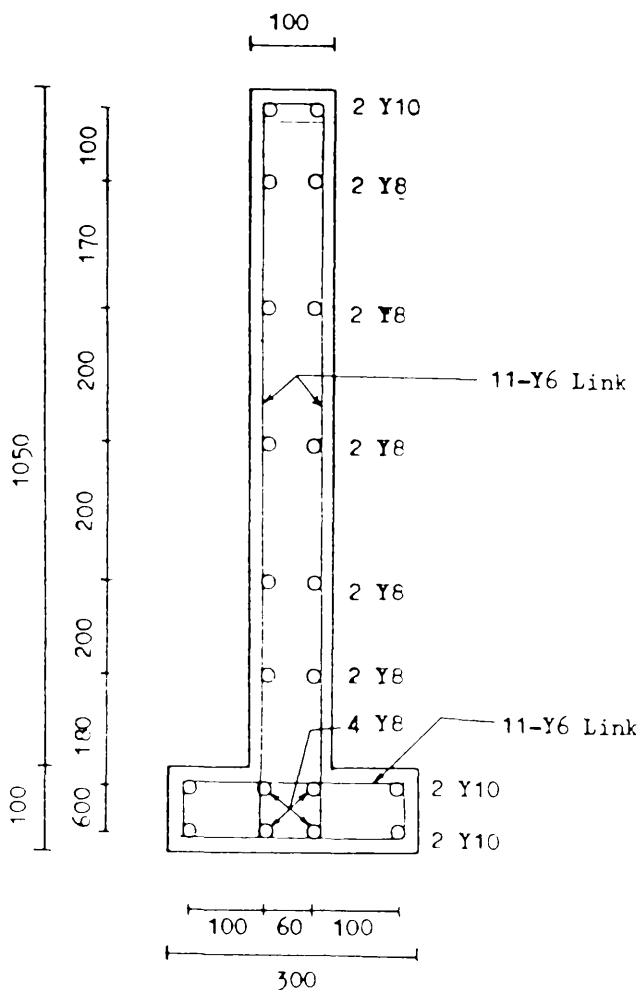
A horizontal section in the wall of model MS10 showing the reinforcing details
